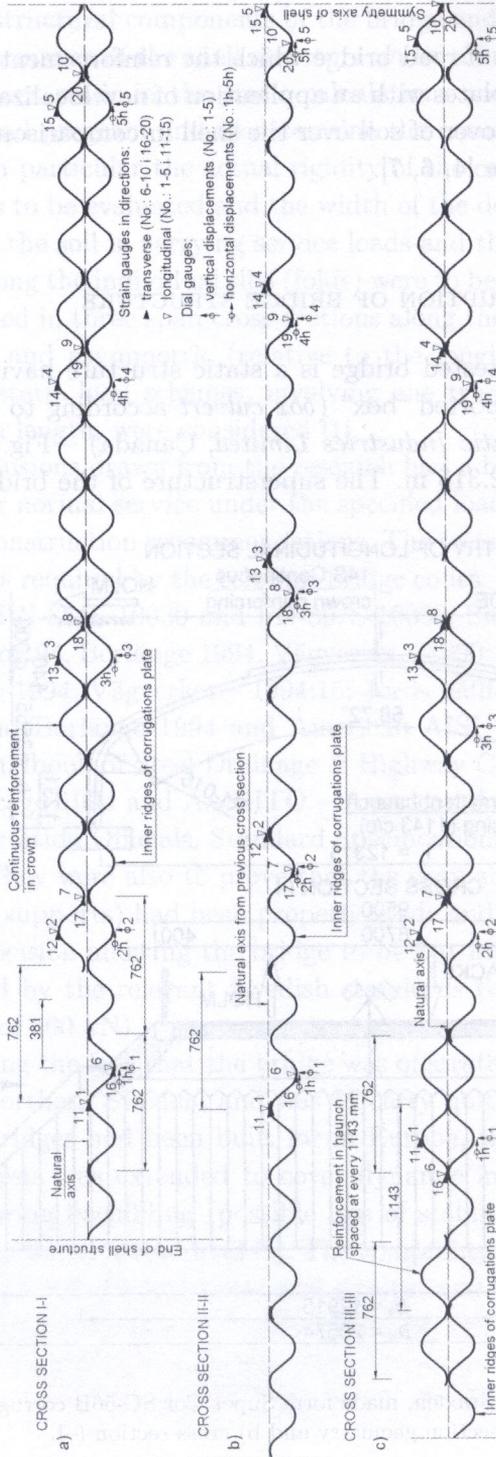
Location of extensometers and dial gauges on particular corrugated plates in three cross-sections of the steel shell: a) I-I, b) II-II and c) III-III.
